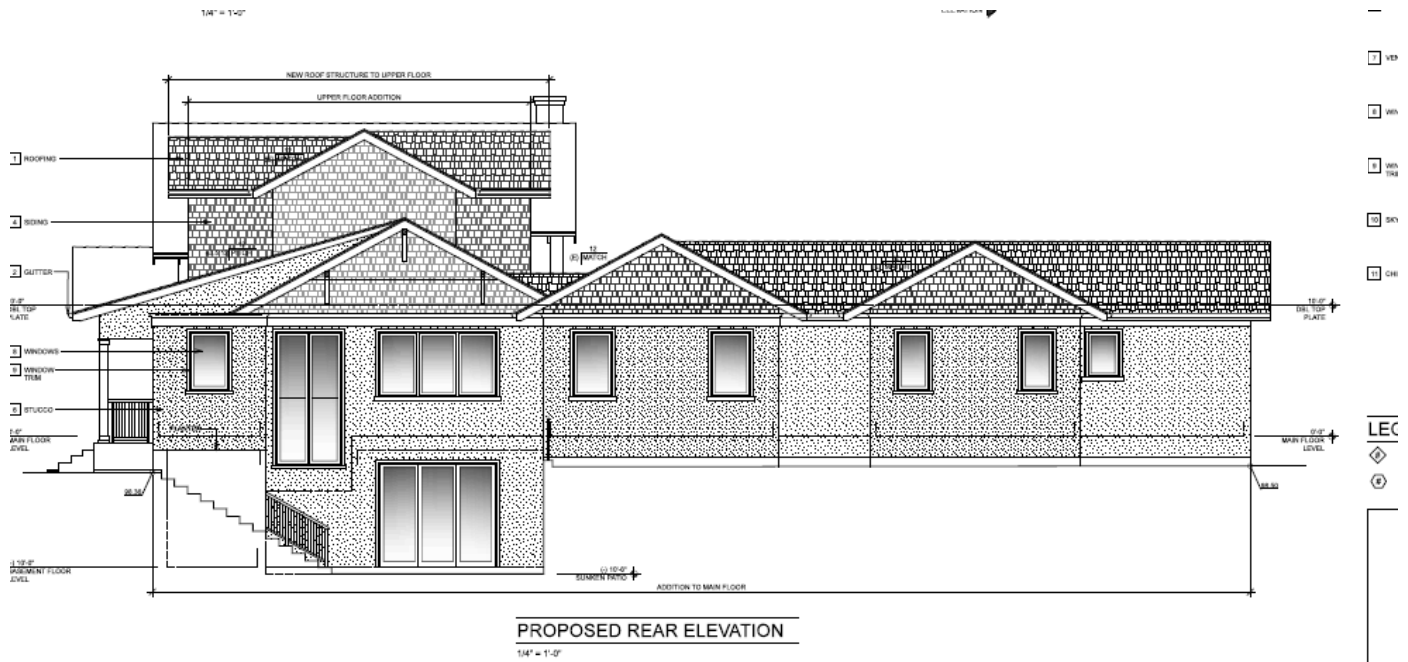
B 236 Eleanor Avenue- Rehabilitation Plan
